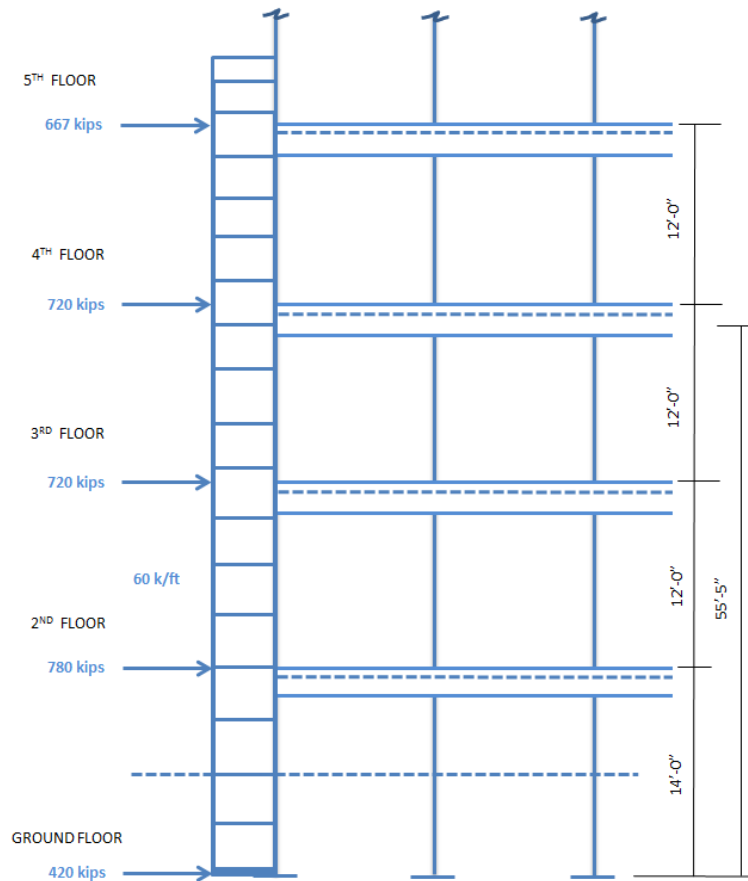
Hydrodynamic loading on exterior column of the Hilo office building due to Load Case 3
